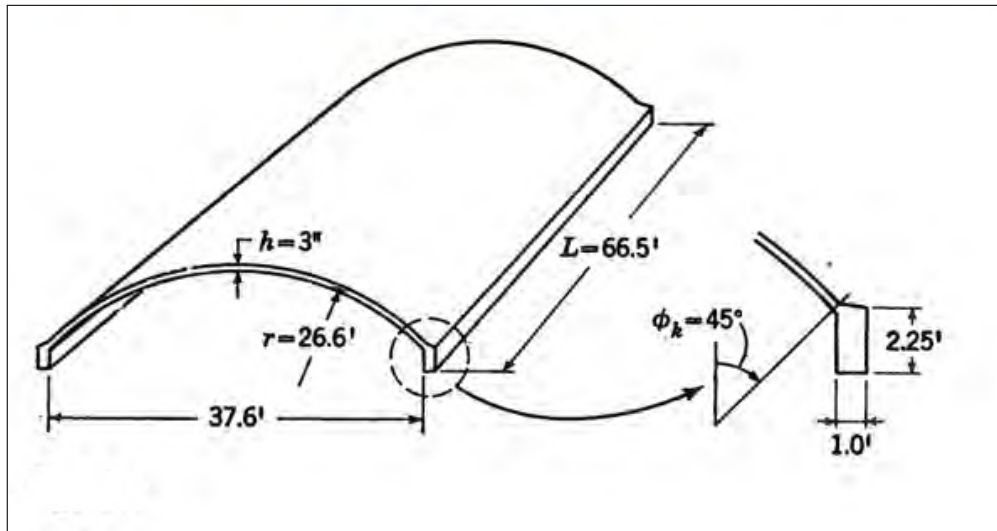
Pennsylvania Warehouse Roof Edge Beam Dimensions, (Billington, 1965)
